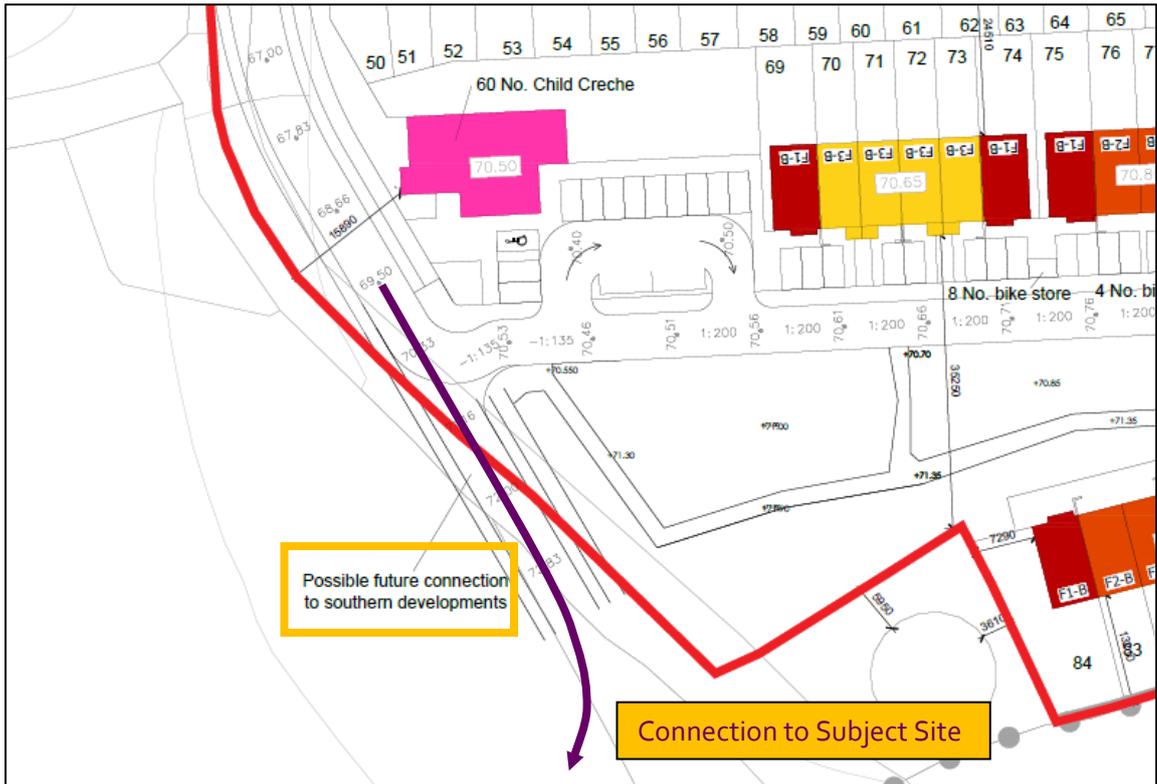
Extract from the Hawks Bay Site Plan illustrating the development's connection to the subject site
